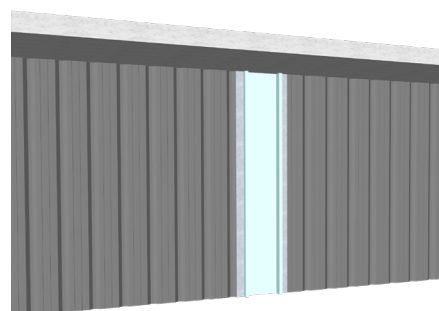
Korok wall to Fireshield® coated steel column - up to 120mins FRR 2 way fire wall.
